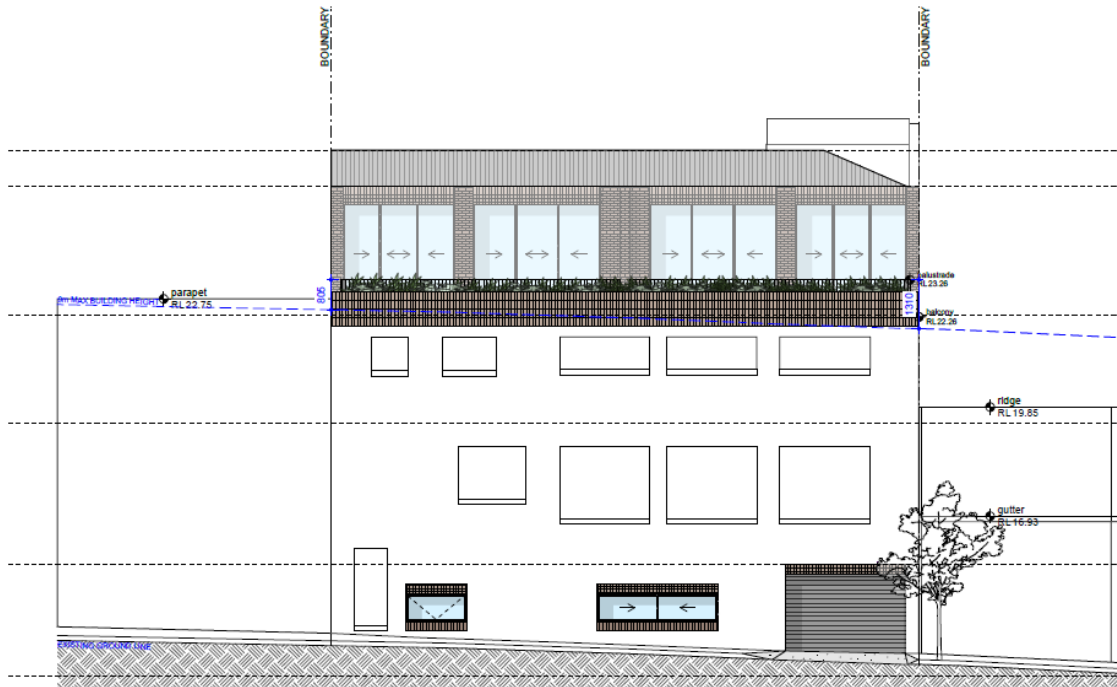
Building height breaching elements as viewed from Little Mount Street.
